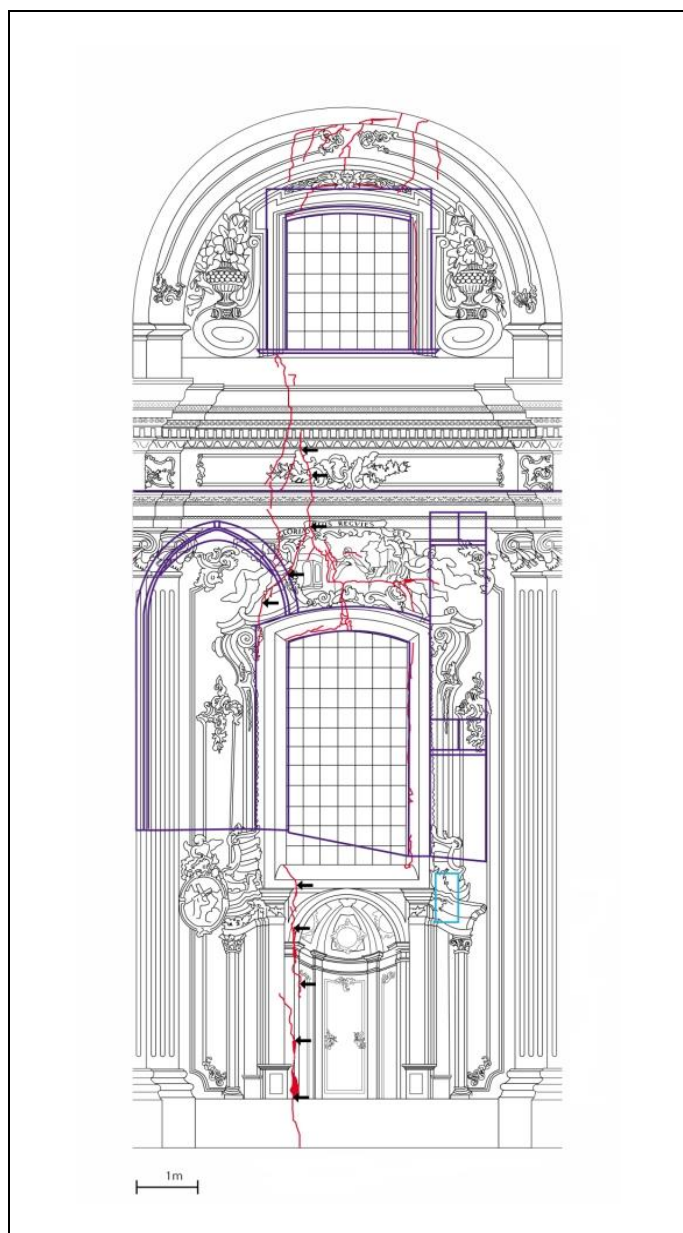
Cracking of the north wall, drawing by B. Rabiej.
